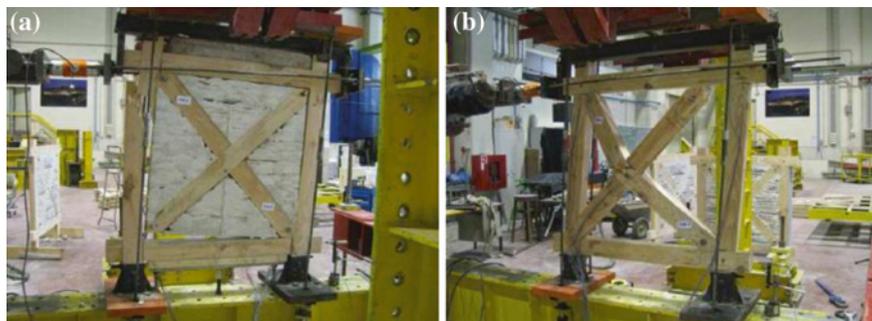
Frontal* walls: a with masonry and b without masonry [14]
